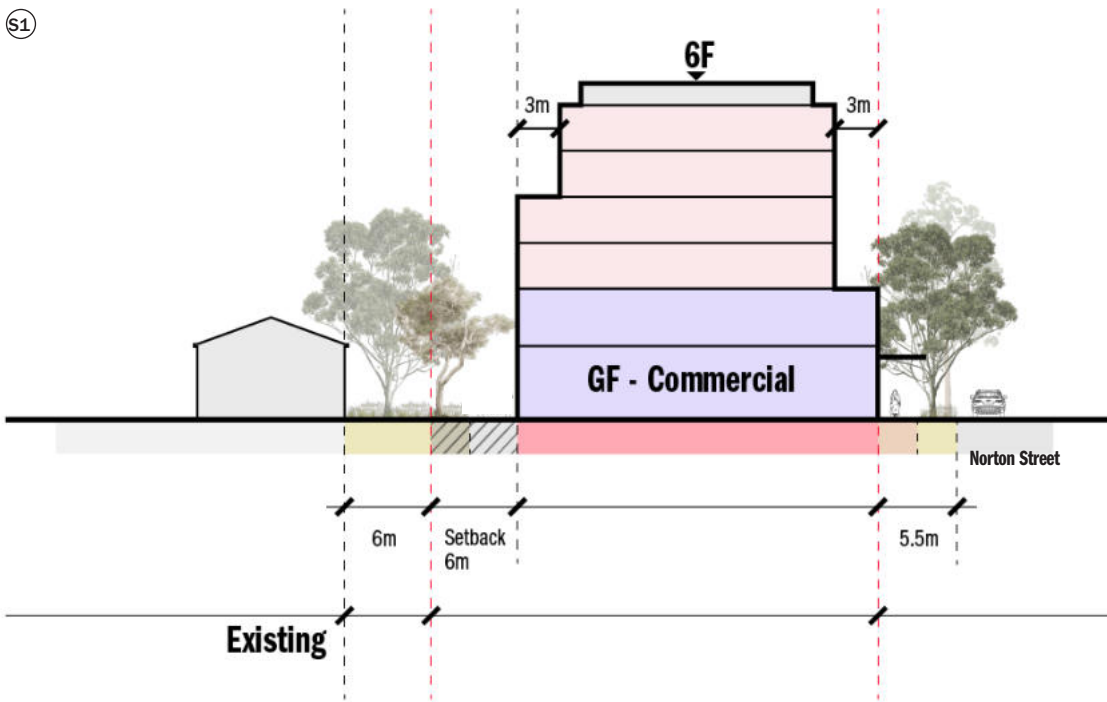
Section 1 - side cross section of a six storey mixed use development on Norton Street with an existing lot at the rear
